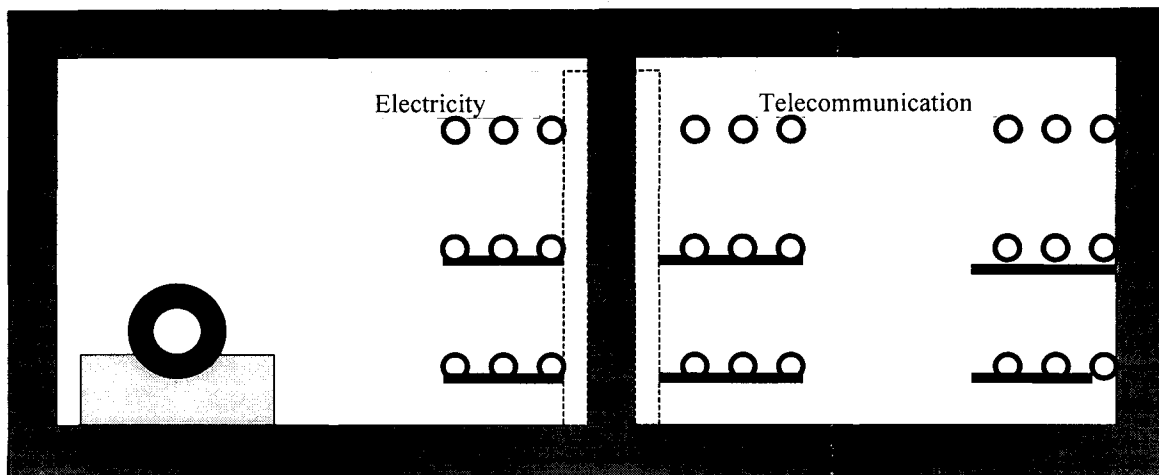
Cross-section of common utility tunnel in existing utility tunnels
